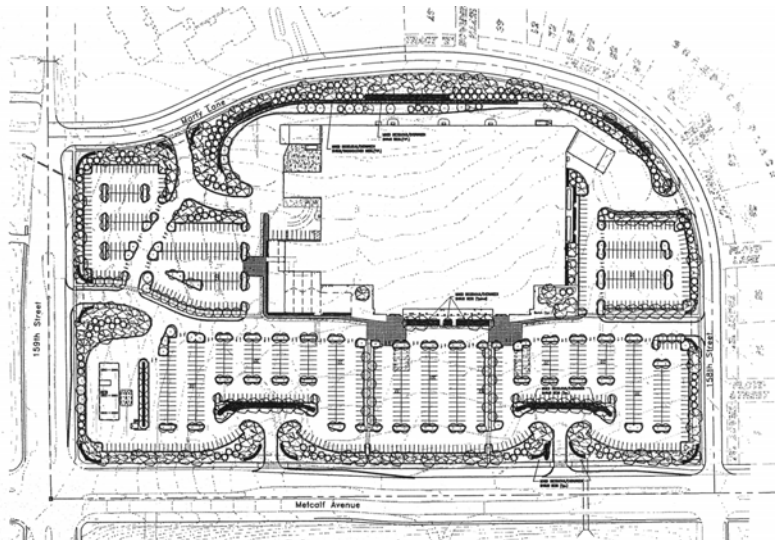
A minimum of 30% of the off-street surface parking spaces provided for all uses contained in the development's primary building shall be located other than between the front façade of the primary building and the primary abutting street (e.g., to the rear or side of the primary building(s)).
